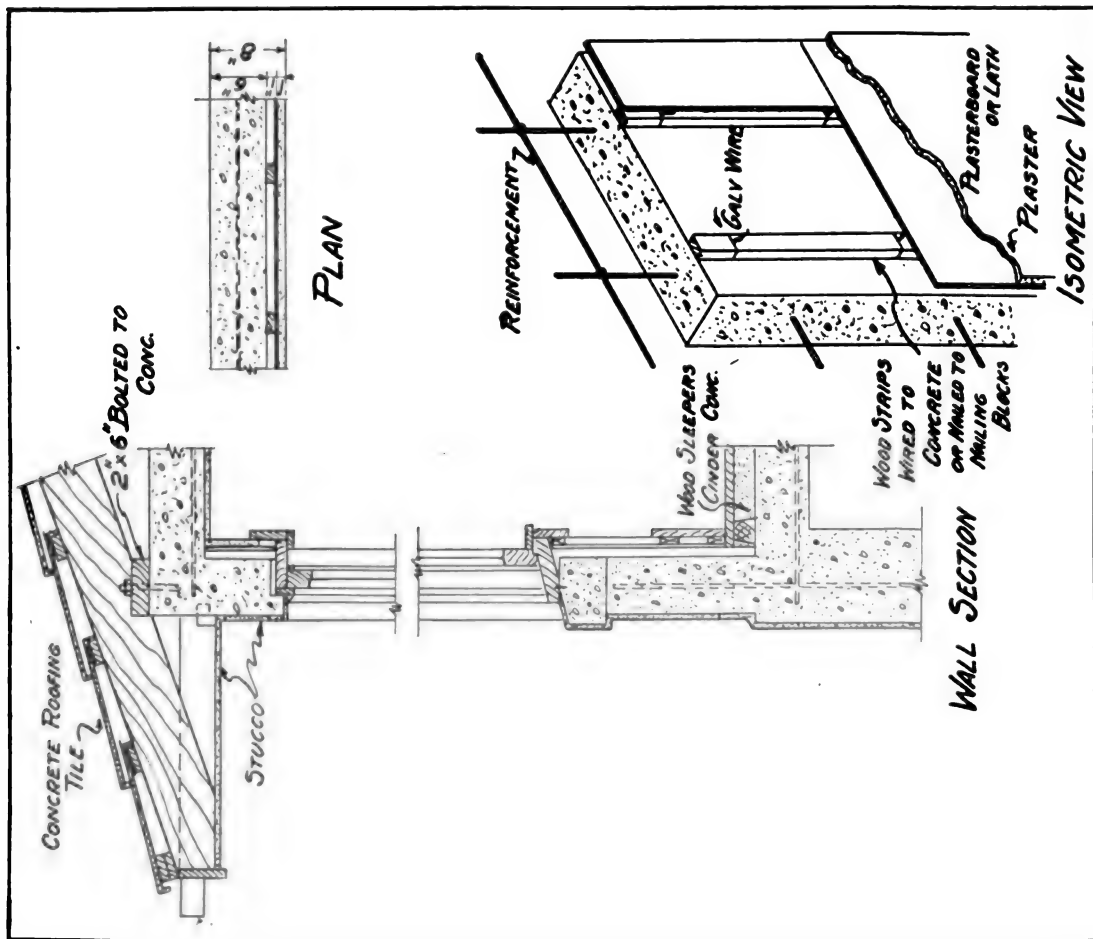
WALL SECTION PLAN AND ISOMETRIC VIEW OF MONOLITHIC CONSTRUCTION.
